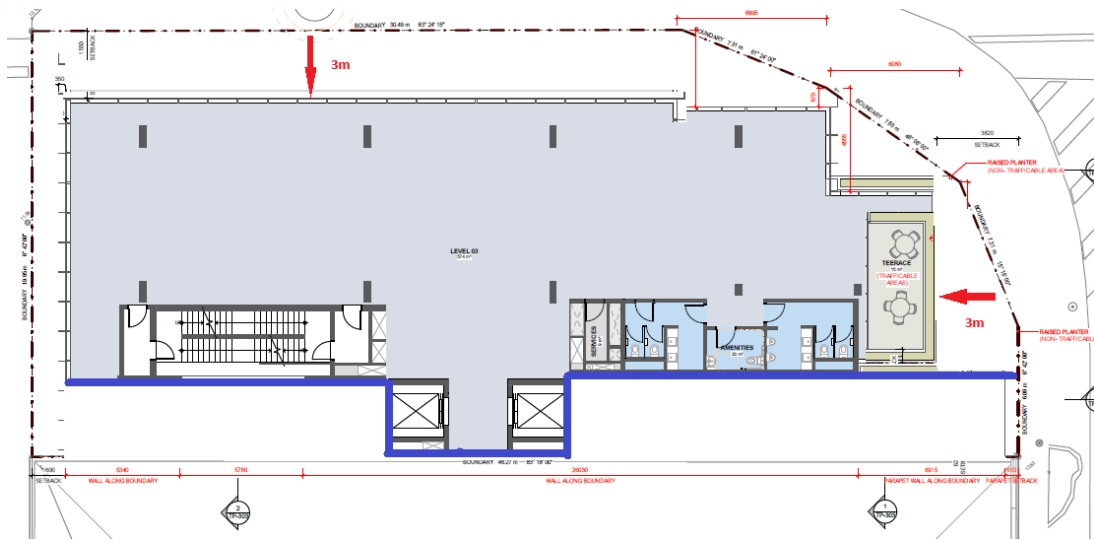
Aerial view of recommended 3m upper-level setback and building separation.
